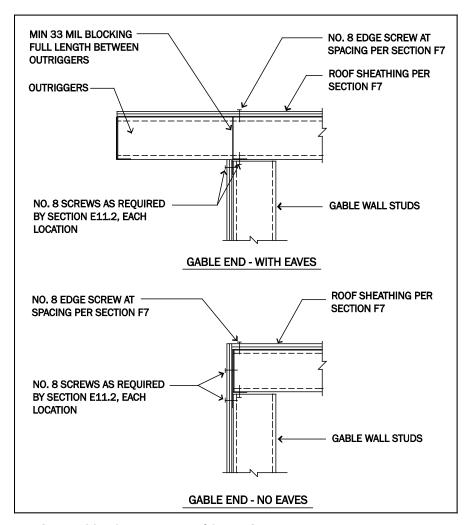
Gable Wall Roof Sheathing Attachment to Braced Walls
